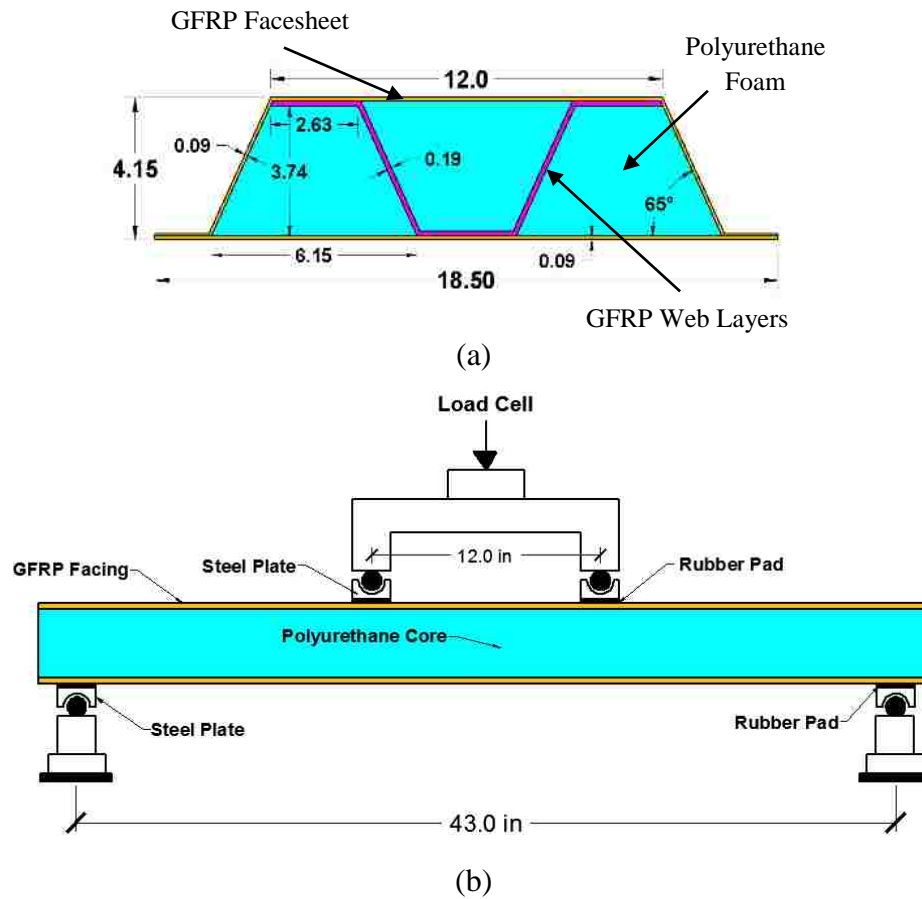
Test setup: (a) cross-section of the developed panel (all dimensions in inches, 1 in. = 25.4 mm) and (b) schematic of static flexural test setup
